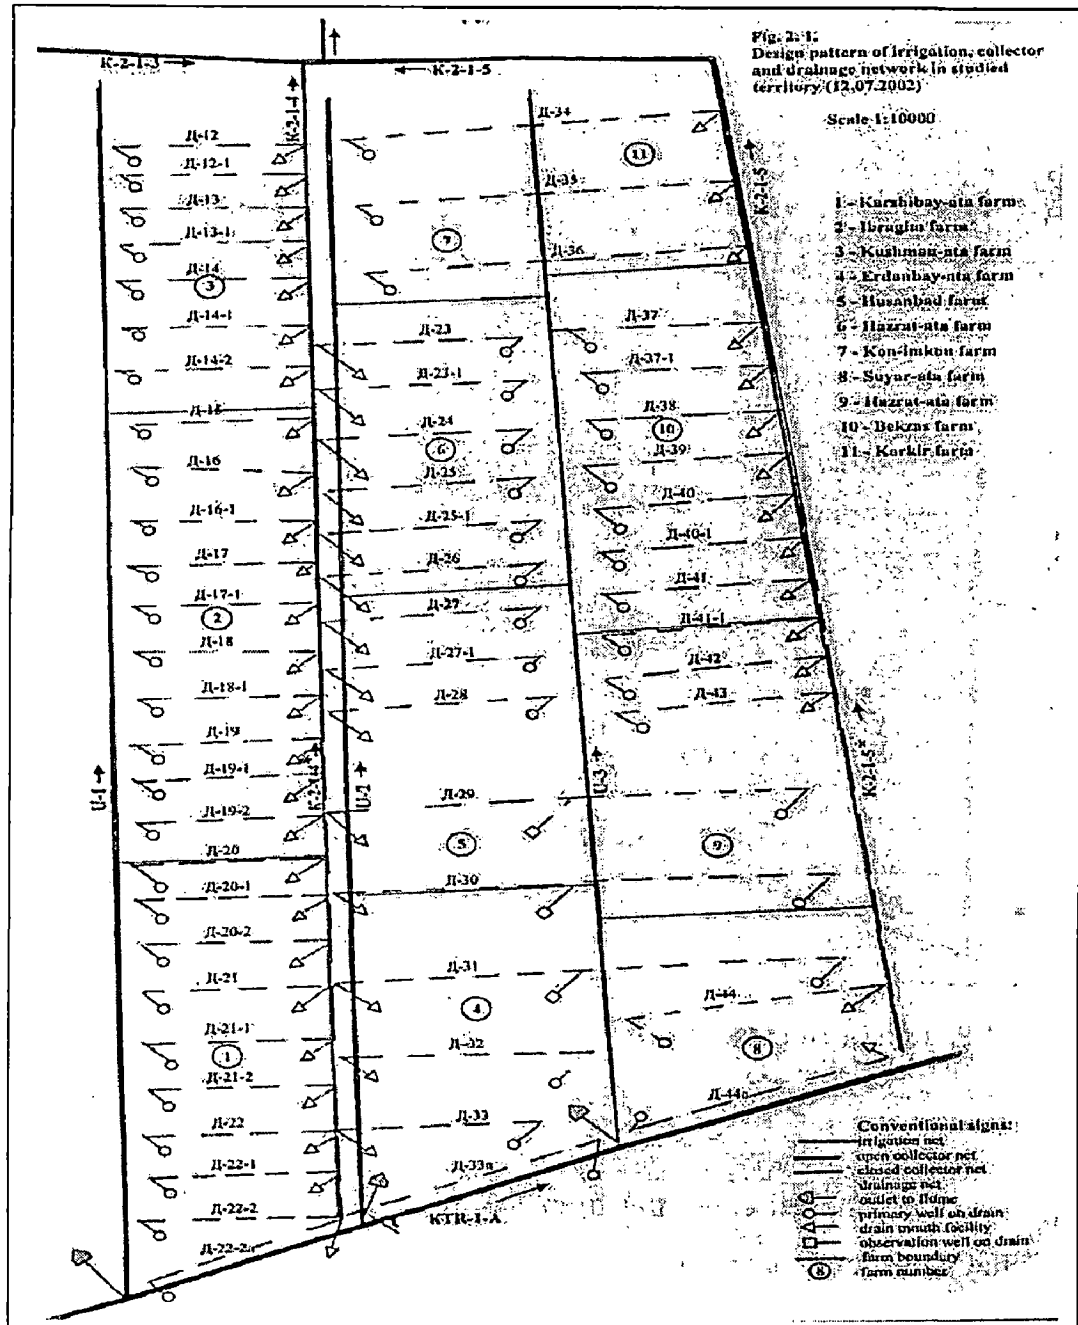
Design Pattern of Irrigation, Collector and Drainage Network
